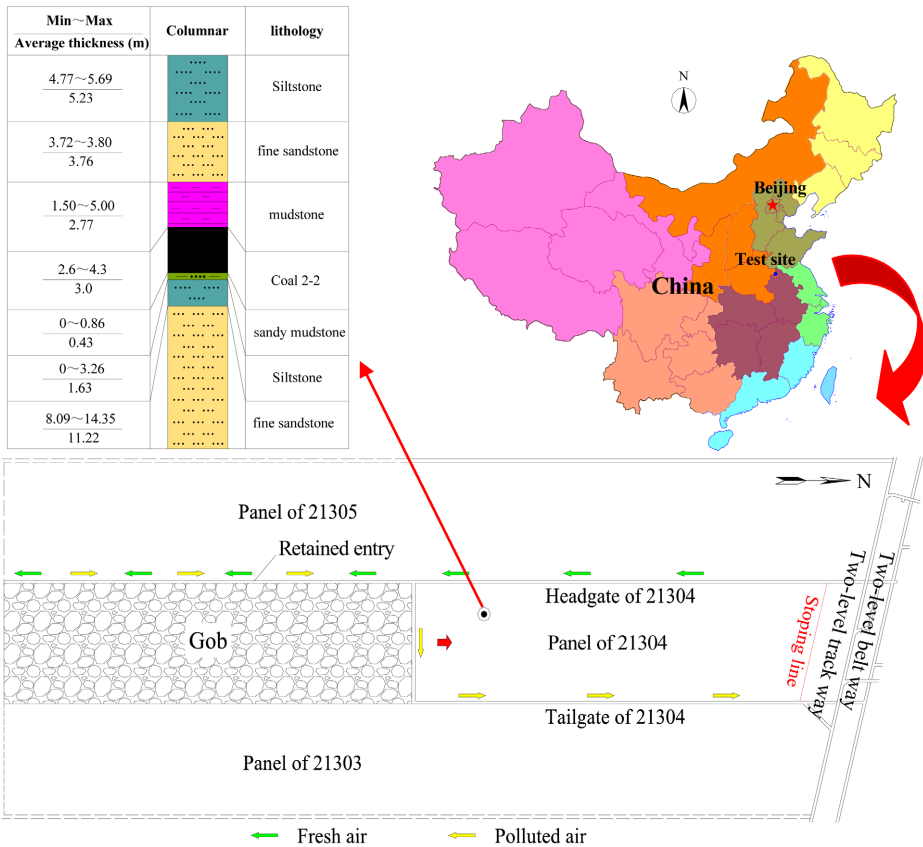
The plane layout of the test site and the lithology of the strata near the coal
